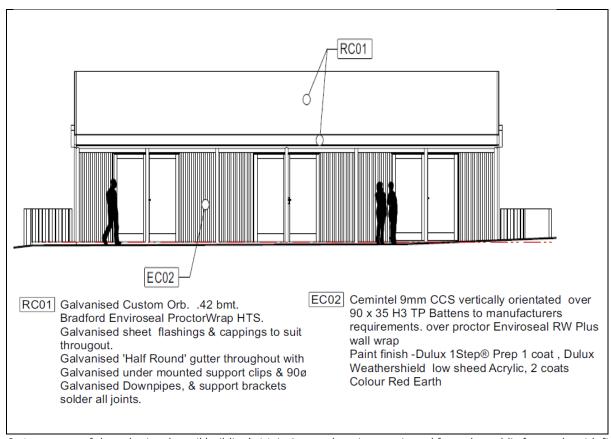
An excerpt of the submitted retail building's Main Street elevation, as viewed from the public footpath, with finishes detail.
